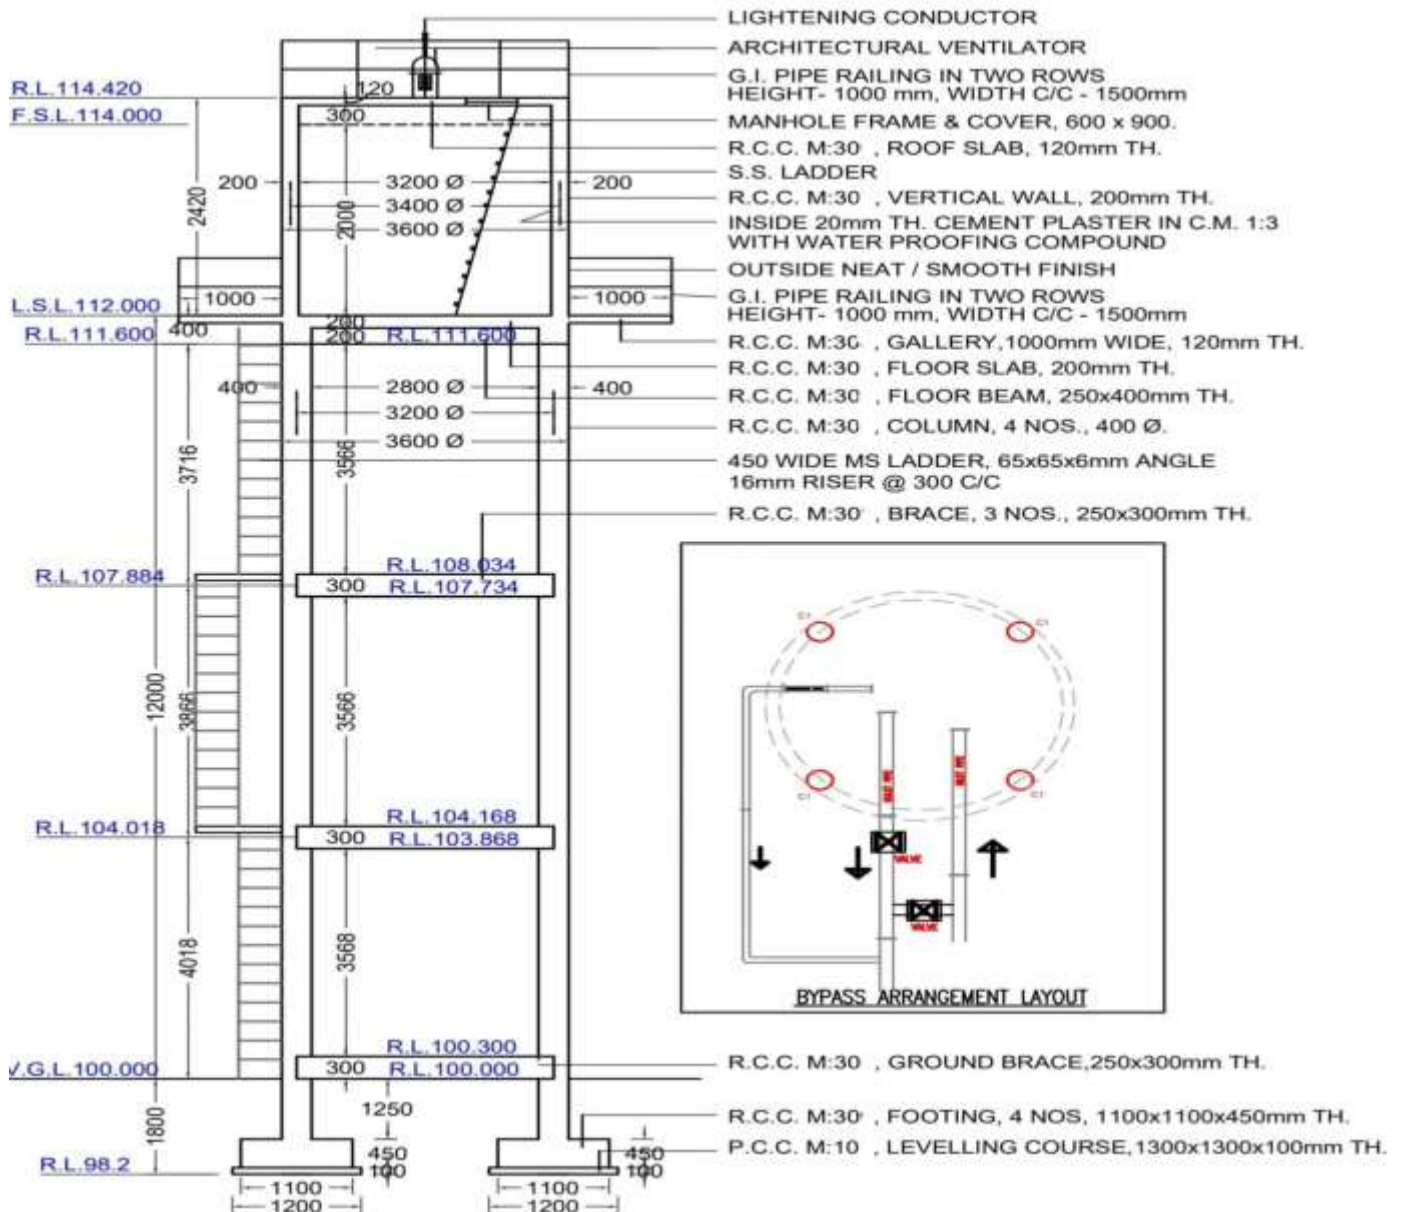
Elevation details of water tank constructed provided by structural designer
